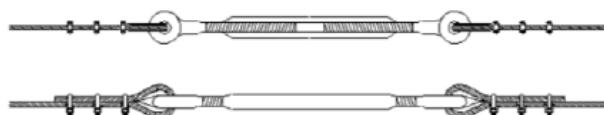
Steel pre-stressing cables used for tying connected with turn-buckles
